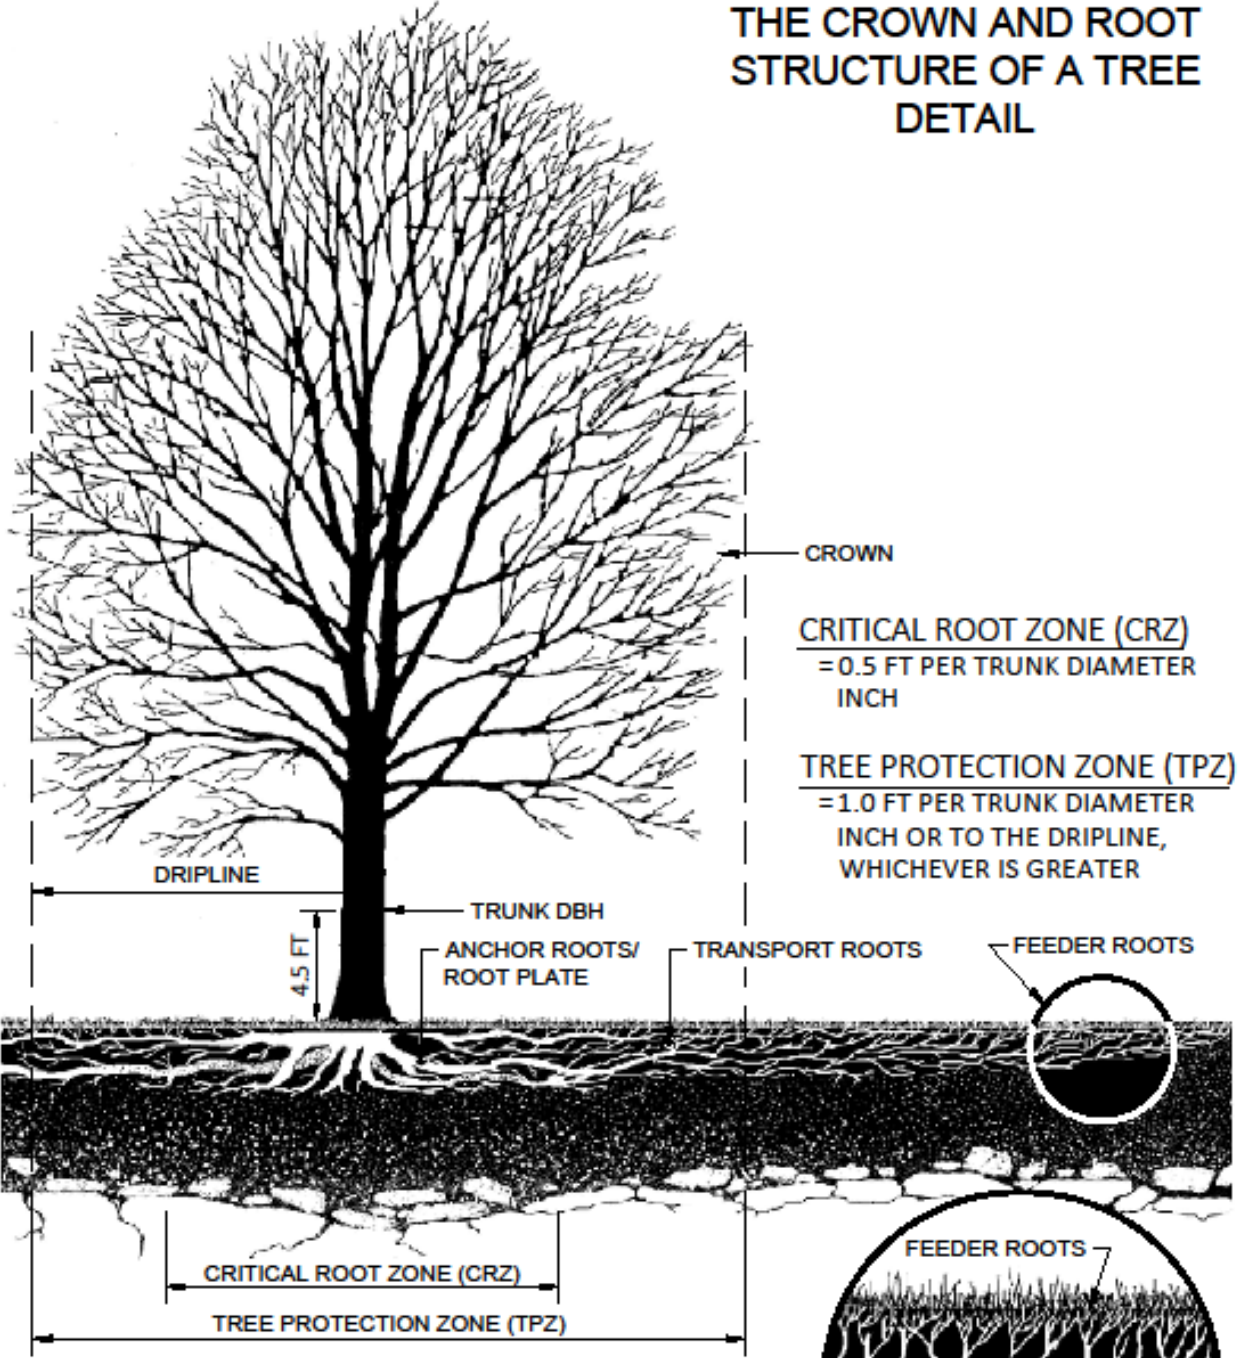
A 24-inch DBH tree would have a Tree Protection Zone (TPZ) extending 24 feet from the trunk.
